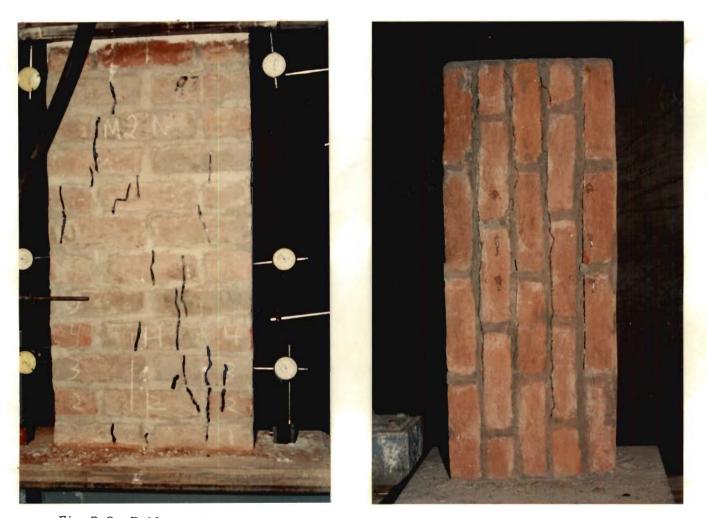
Failure of Brick Masomry Piers subjected uniaxial Loading
